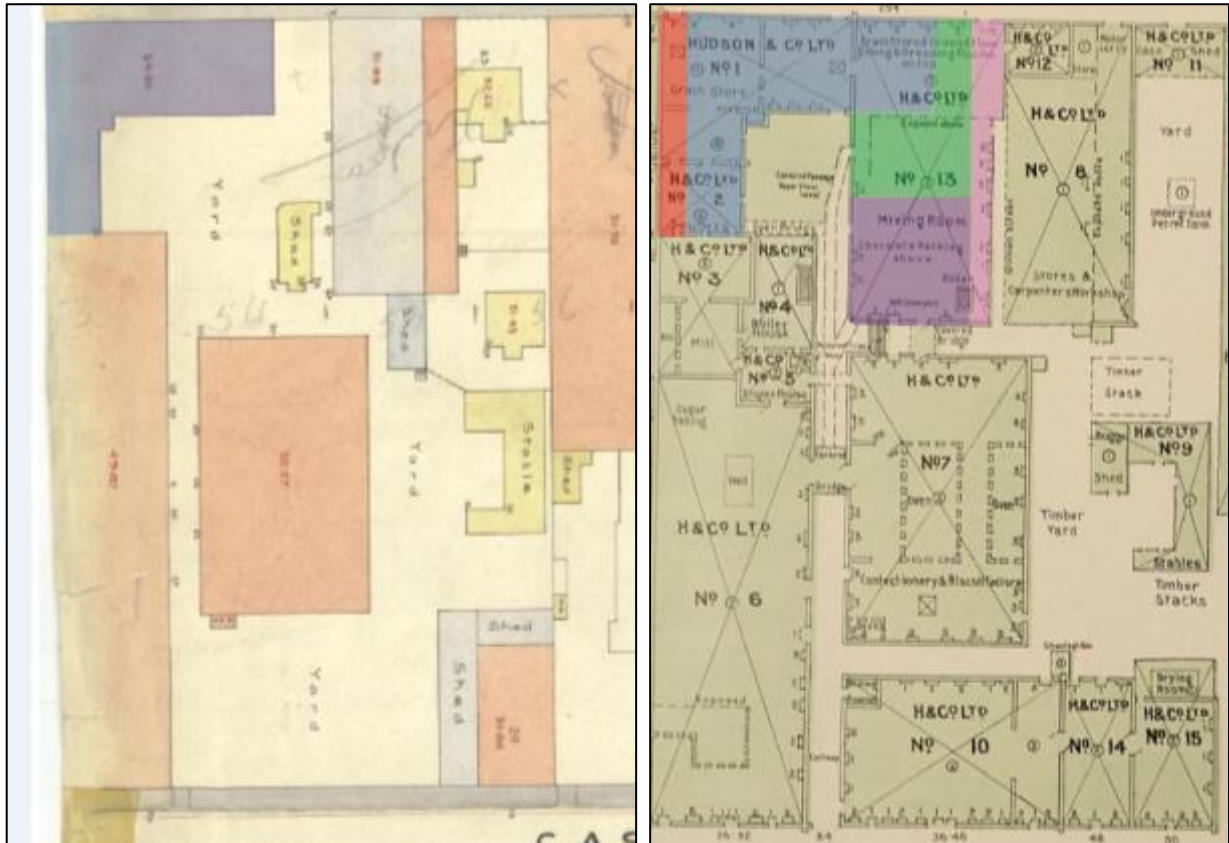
Left: detail of 1905 drainage plan showing brick (orange), timber (yellow) and iron (blue) buildings on site I44/817 (Dunedin Drainage and Sewerage Board, 1905). Right: detail from 1922 plan showing buildings and occupants on site I44/817 (Council of the Fire Underwriters Association of New Zealand, 1922). The original 1868 granary granary/malt floor and kiln buildings are highlighted blue. Subsequent alterations are highlighted red for Phase one (undertaken in 1901 and present by 1905 but just out of picture on the right image), purple for Phase two (1909), green for Phase four (1915), and pink for Phase five (1915-1922). Phase three (1901-1915) here is not shown on these plans it featured additional upper floors only rather than a horizontal extension.
